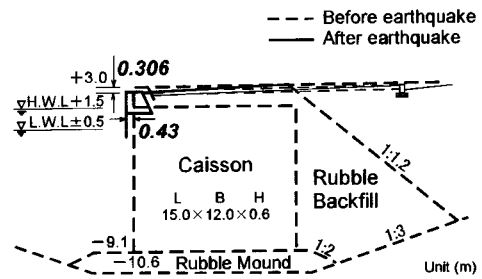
Cross section and deformation of a quay wall at Kushiro Port (West Port District No.2 West quay wall -9m)
